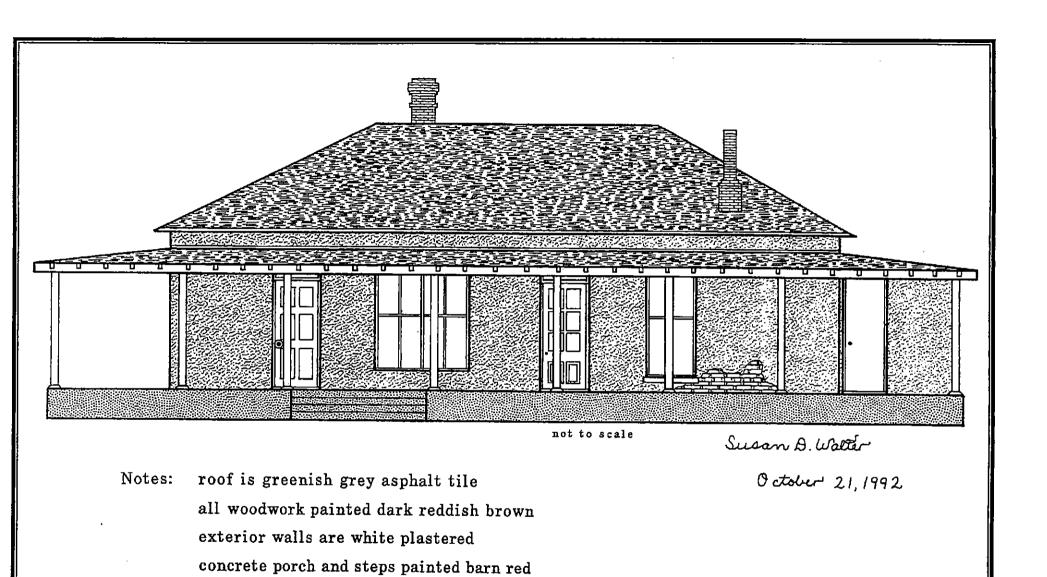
MONTECITO RANCH HOUSE, EAST ELEVATION, ILLUSTRATION 1992 (photo courtesy Mooney \* Jones & Stokes)
